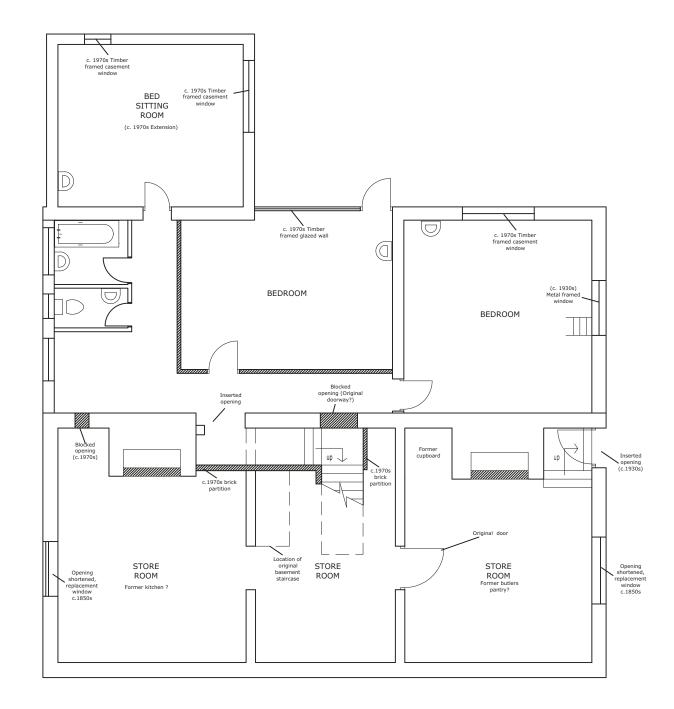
Walnut Tree House (B.30)) - upper ground floor plan
